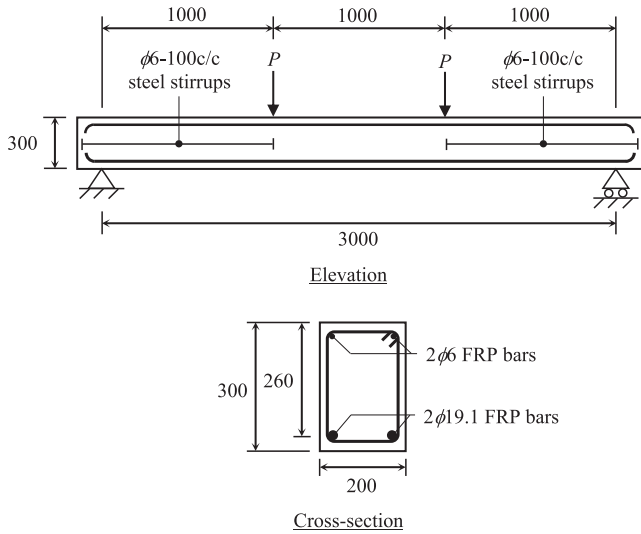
Layout of beam ISO1 (dimensions in mm).
